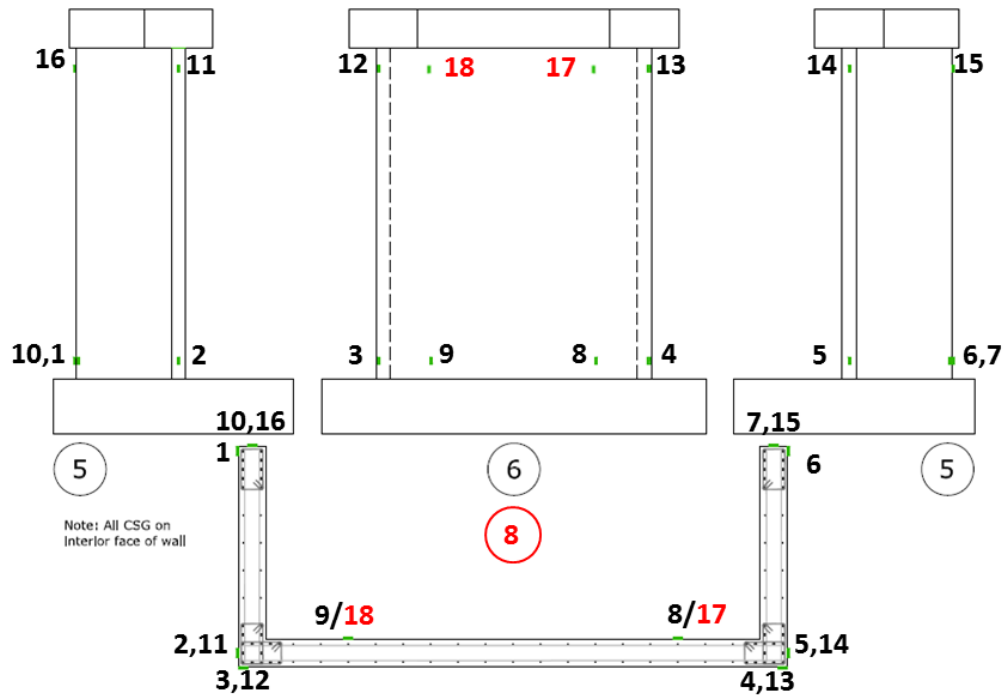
Concrete surface gauges (red indicates additions for Wall 6 & 7)
